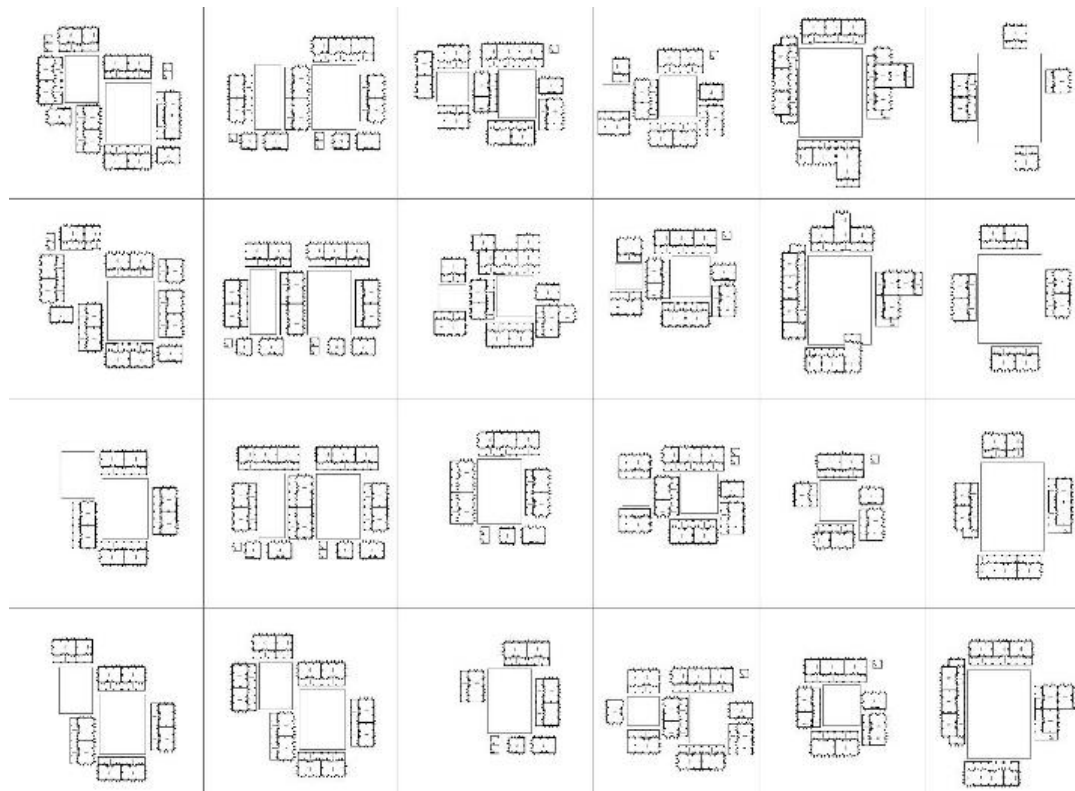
Possible growth and shrink of proposed modular house (Source: Authors).
